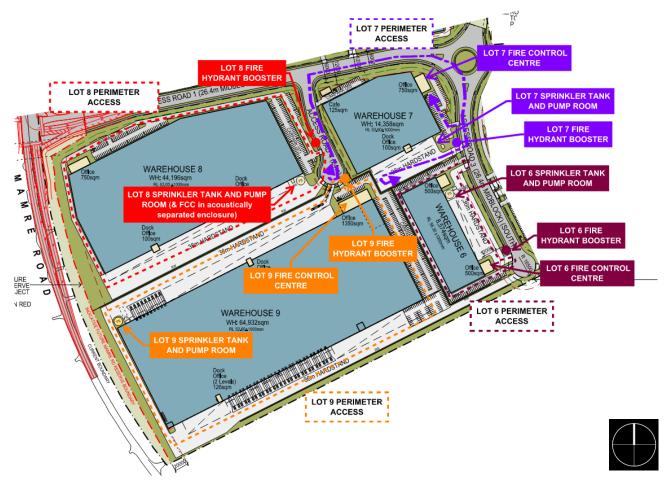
Fire Brigade Access and Site Facilities – Southern Side
